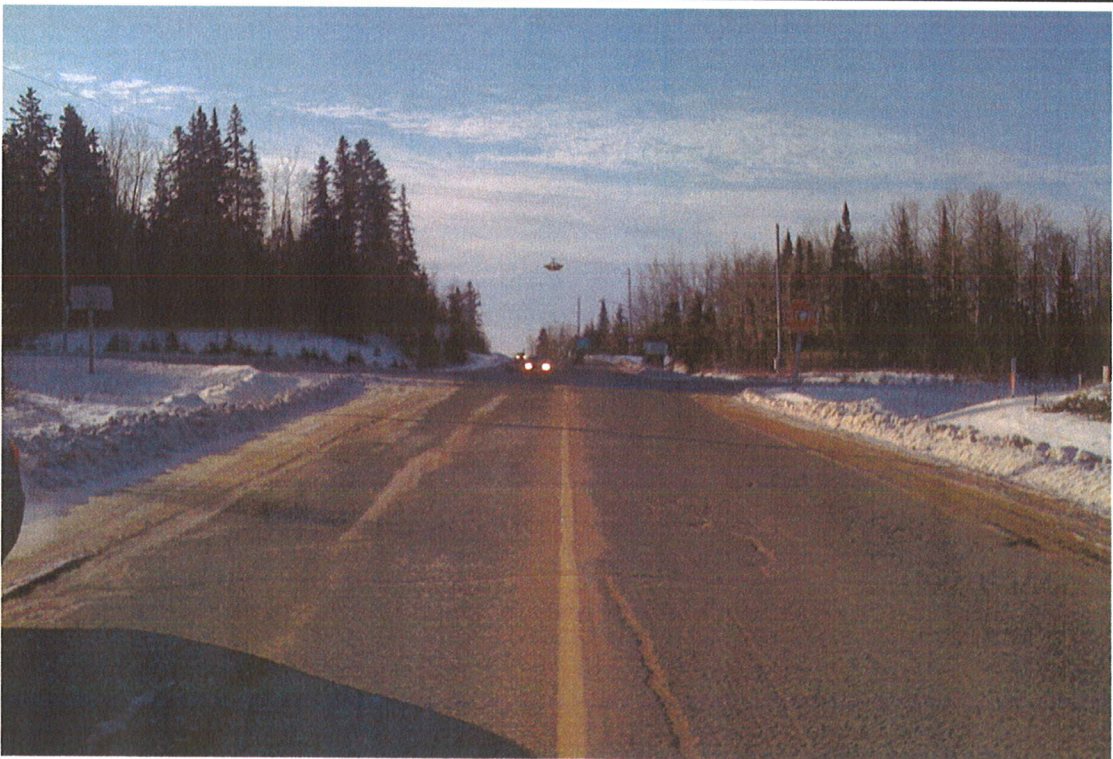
Looking South on Copenhagen Road towards Hwy 11/17 intersection
